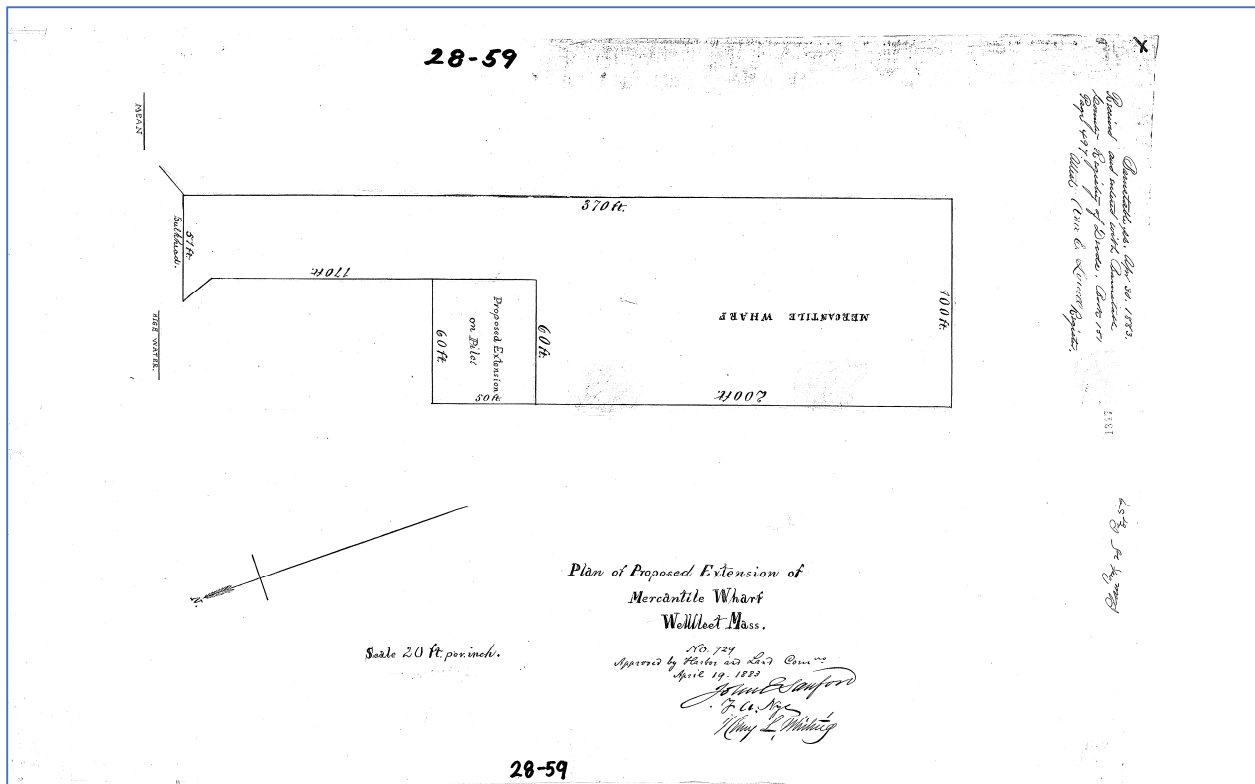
Plan of Proposed Extension of Mercantile Wharf (1883)
